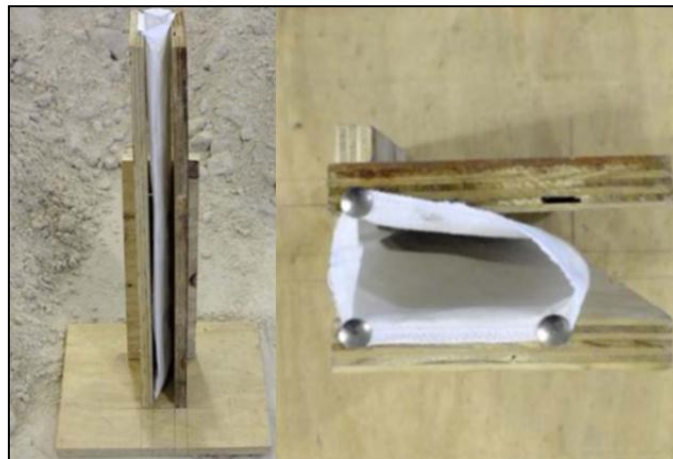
FORMWORK USED WHILE FILLING MODEL GEOTUBES
